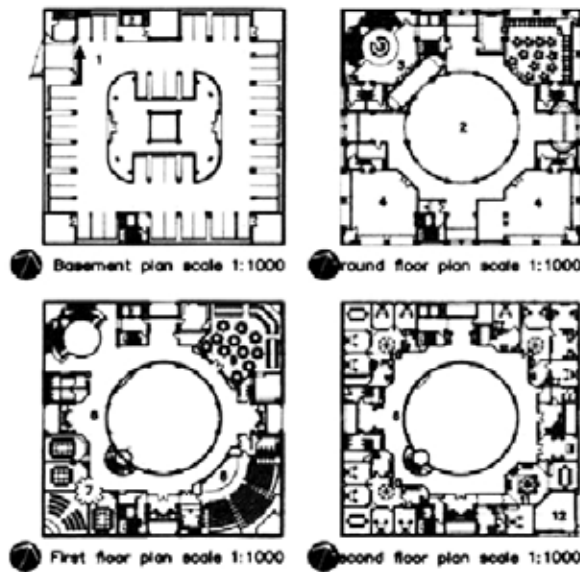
The city hall floor plans. (Abu Ghanimeh, A., Haddad, M., & Alshboul A., 2013. Modified by the authors)
